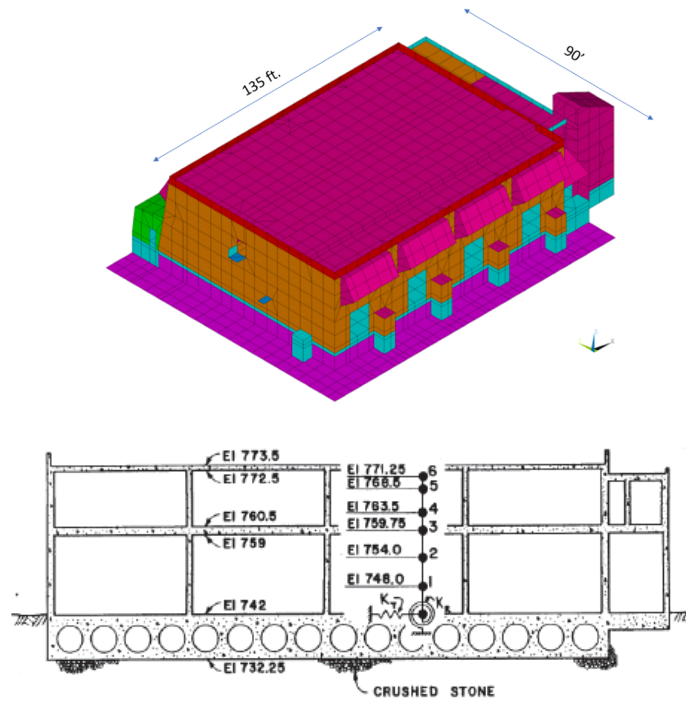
FE Model Isometric View (Top) and Elevation Section View (Bottom) of the Building Used for Numerical ISRS Computation
